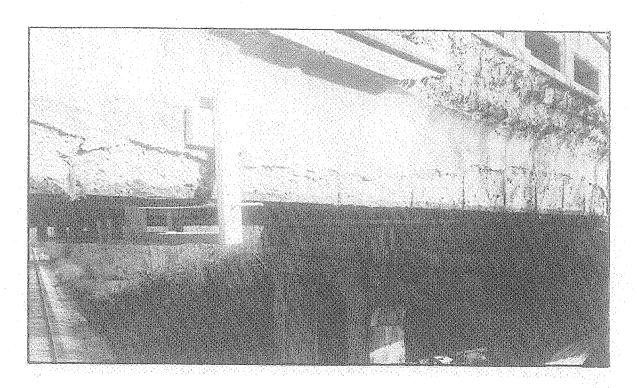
South Fascia Beam (Beam 9) Exposed Reinforcement Full Length of Span 2.
